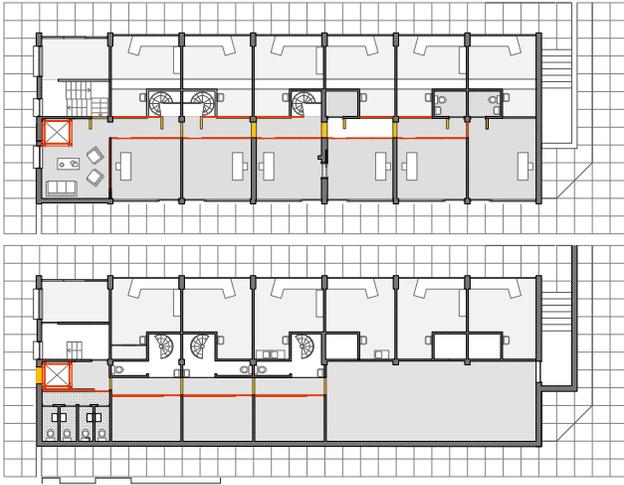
New layout proposal concerning the main pavilion of the Market; ground and first floor plans (drawing by Paula Trigos García).
